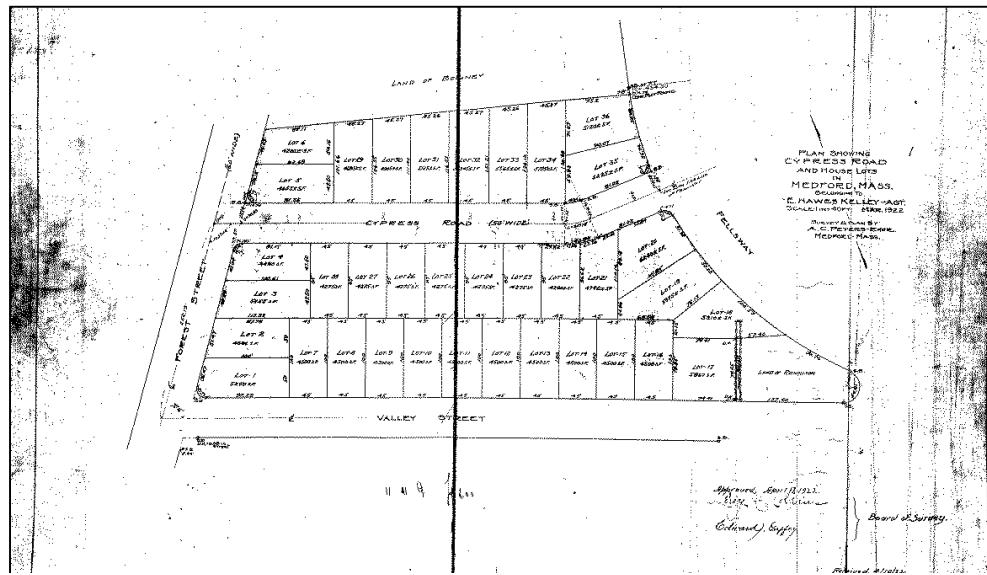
Plan showing Cypress Road...belonging to E Hawes Kelly; MCSRD 303:48 1922
